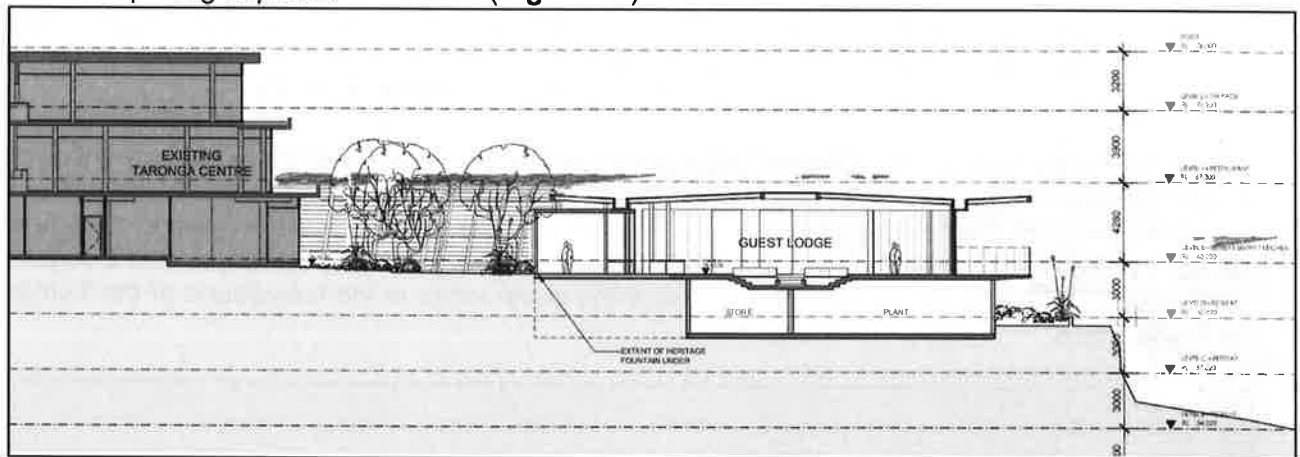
Section of proposed guest lodge in relation to existing Taronga Centre (Source: Architectural Plans)
